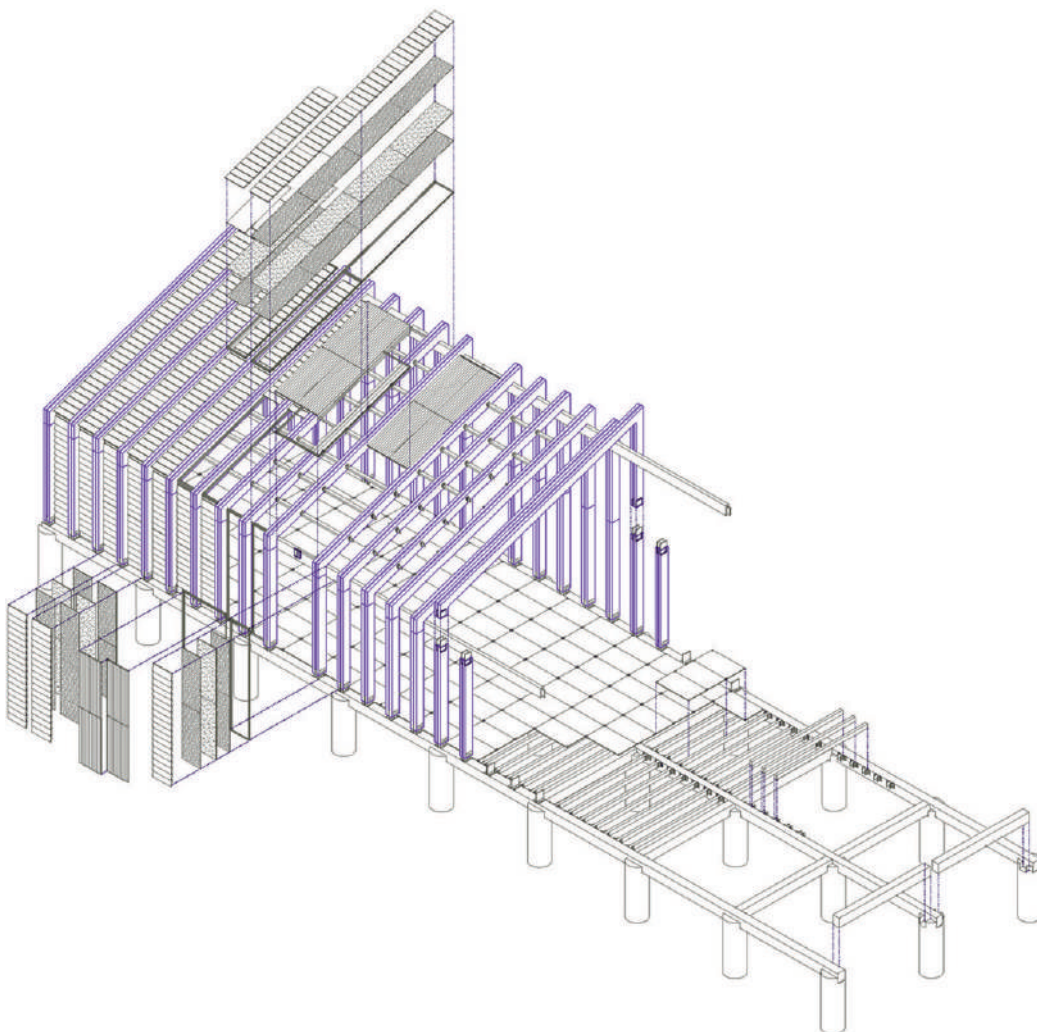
Inside space unit; pavilion for productive activities: axonometric exploded view of the building system.
